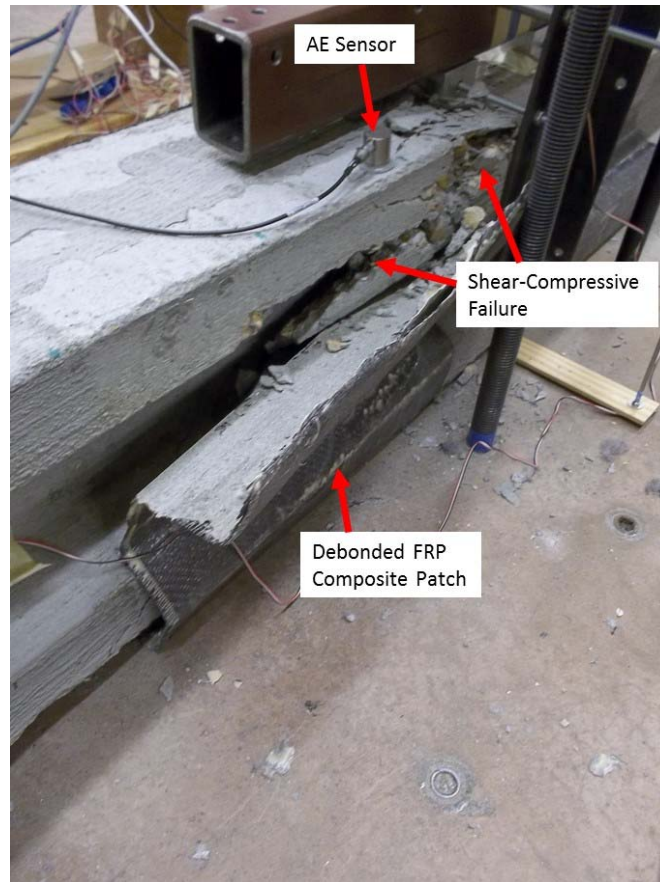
A view of the gages, transducers and the failure in the repaired girder.
